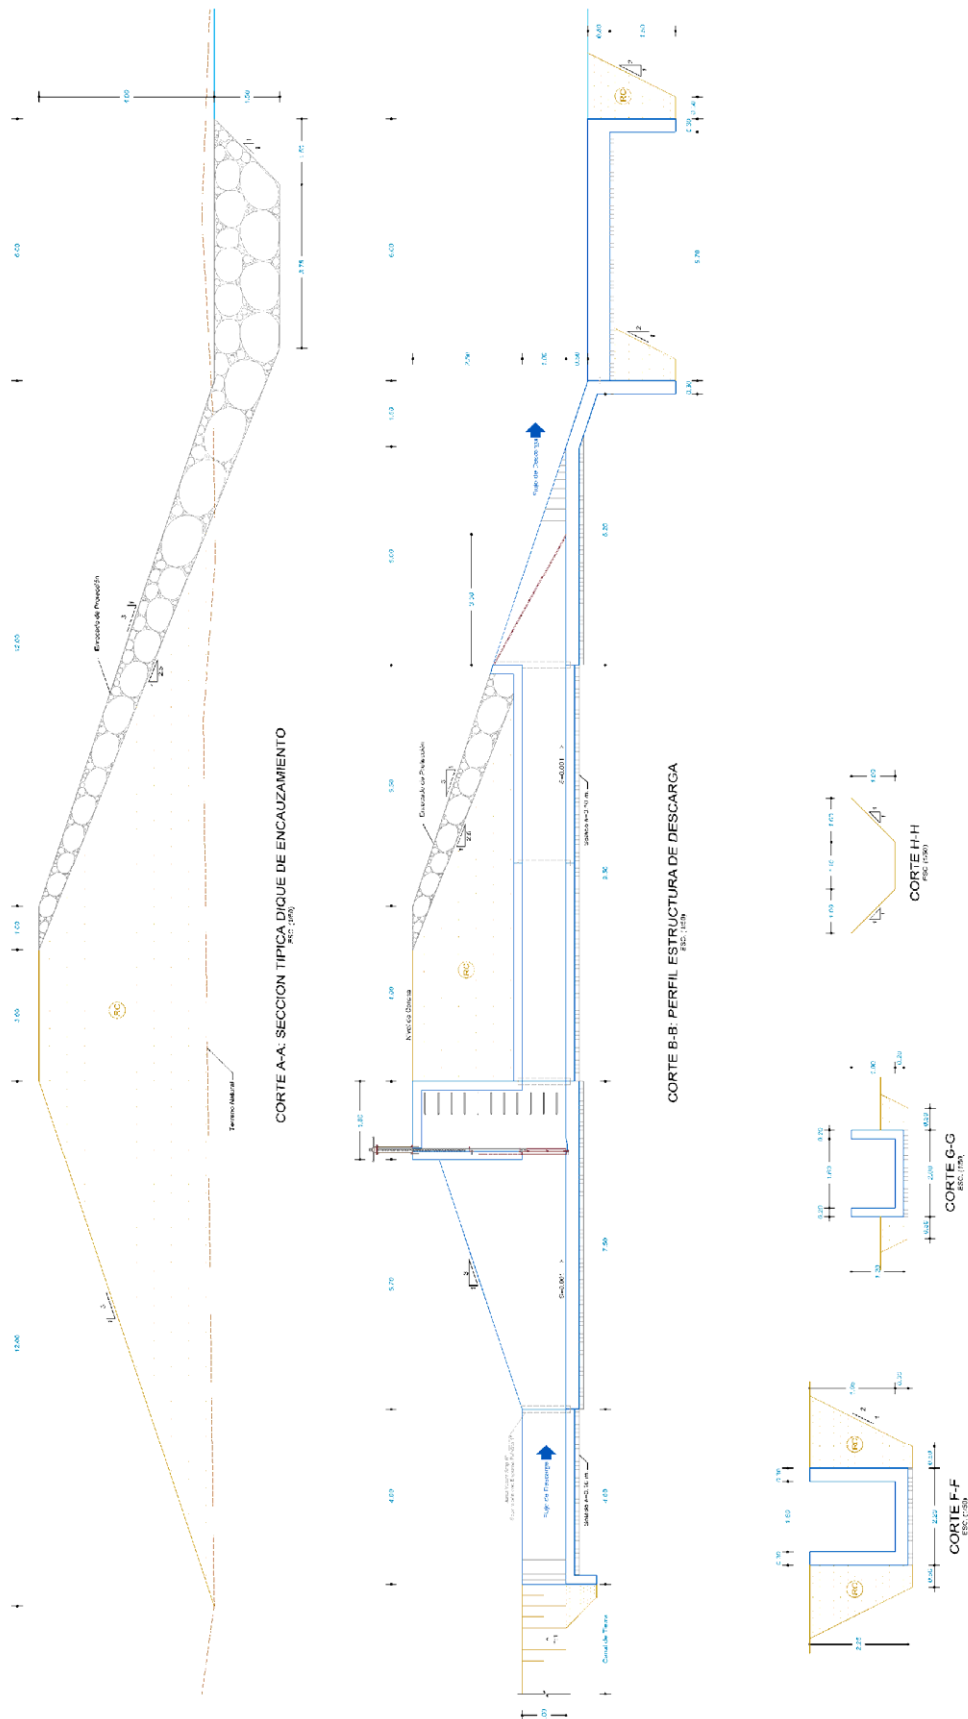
Structure Drawing of Drainage Facility Type II (2/2)
